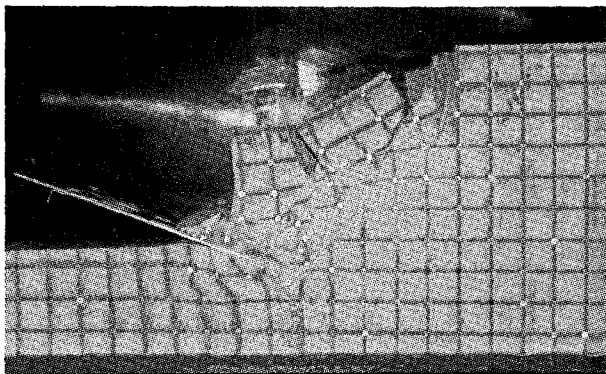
Failure of sheet pile wall (unpropped). (Test D 3)
